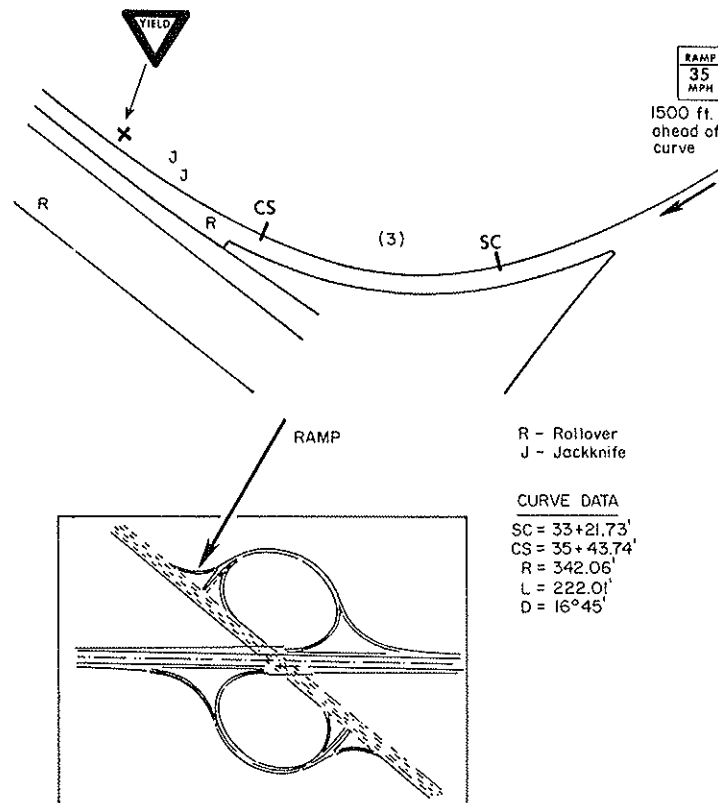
Layout of site that poses a challenge to truck roll stability level.
